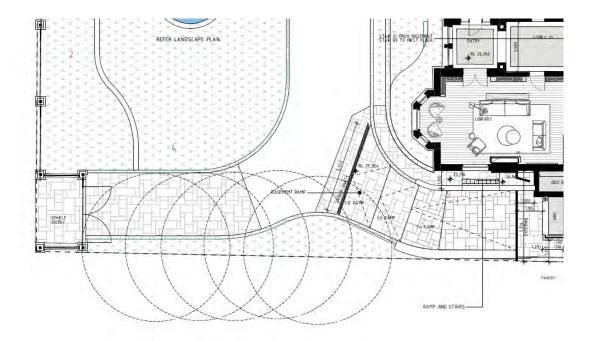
Location of basement ramp (advertised plans) (Source: Applicant)
